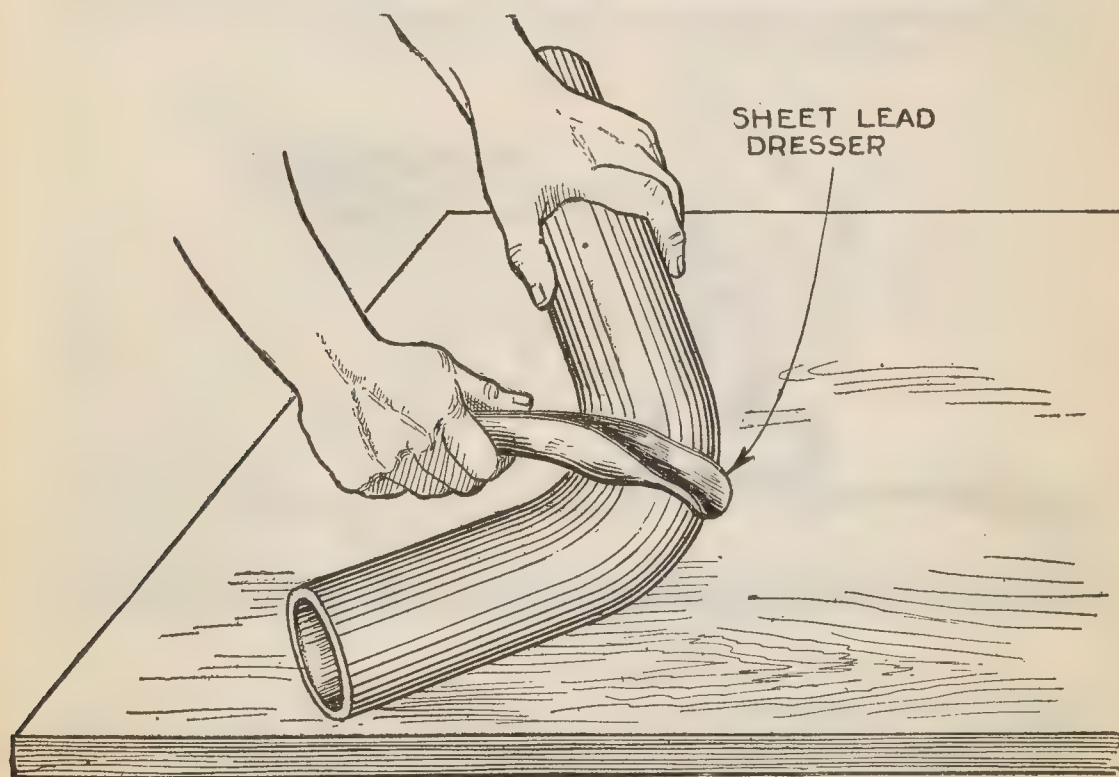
,529.—*Bending with dummy and dresser, 5.* Final dressing with sheet lead dresser,
